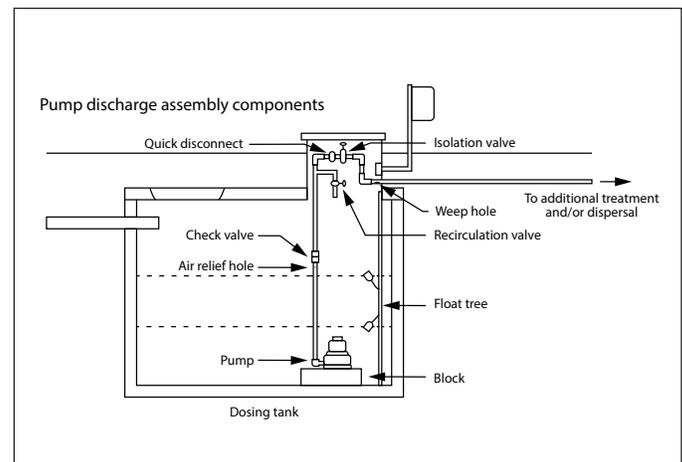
Components of a well-equipped pump discharge assembly (profile view).
